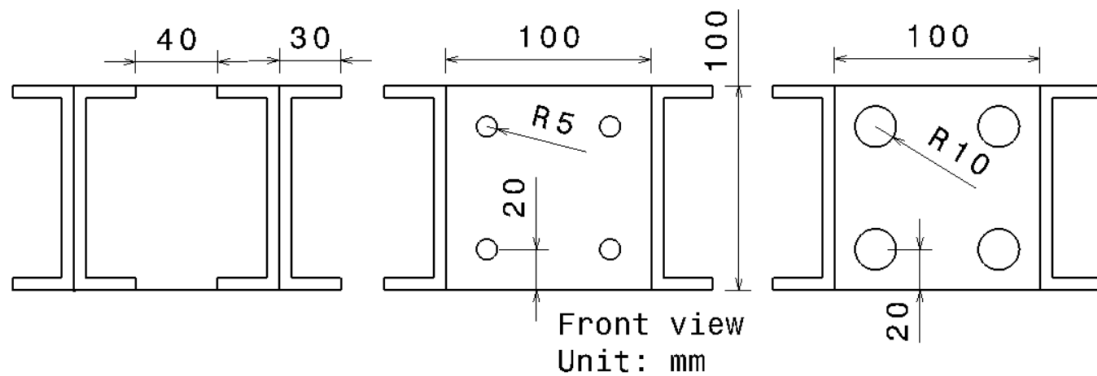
Group 3 - Double C-section & Concrete Beam with rebars
